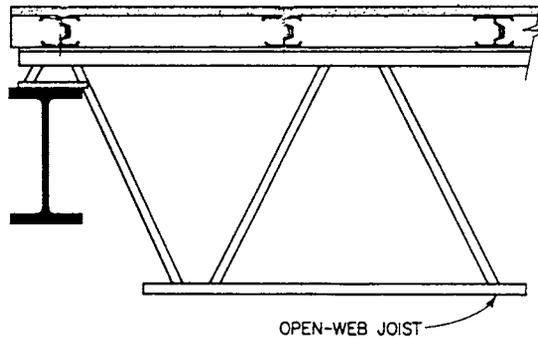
Open-web steel joist supports gypsum deck.
